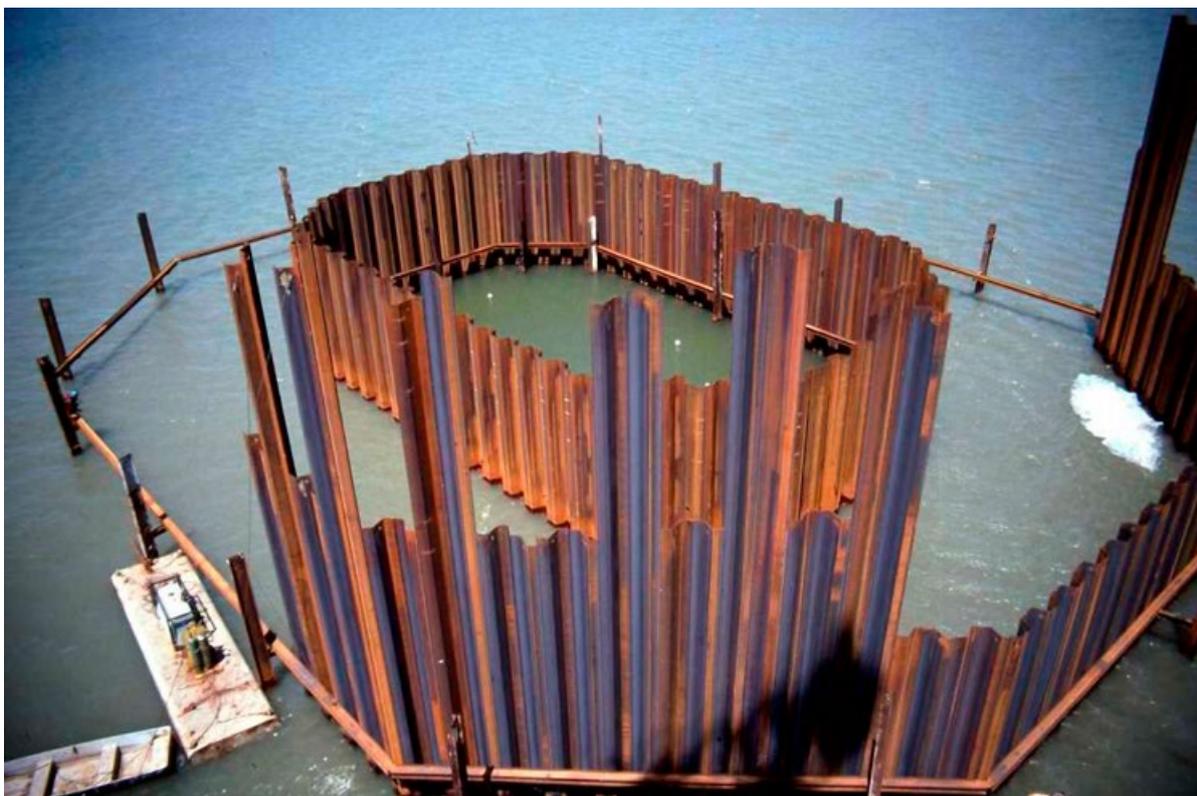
Construction of a cofferdam made of steel walls around the La Belle wreck
